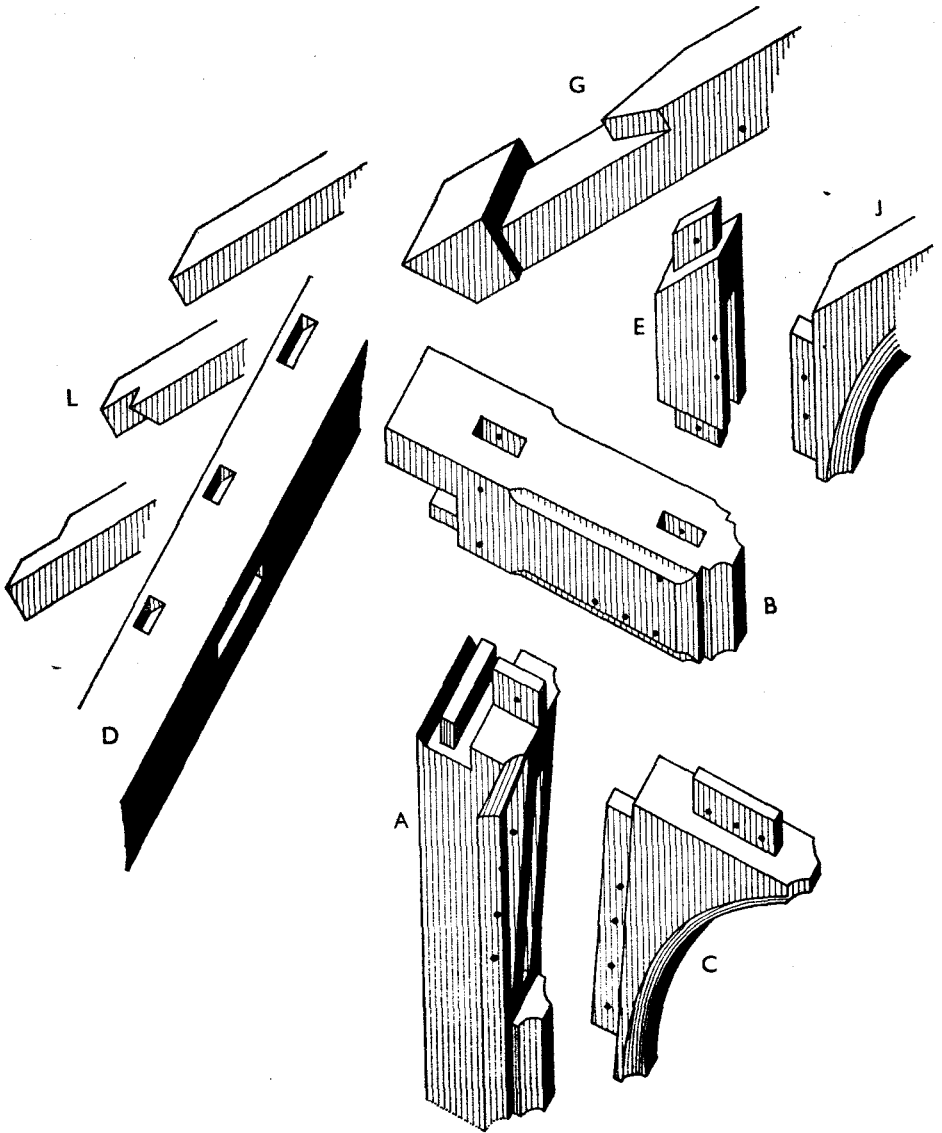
Exploded drawing of hammer-beam joint. A principal post, B hammer-beam, C hammer-beam brace, D top-plate, E hammer-post, F Lower wind-brace, G truss-blade, H lower purlin, I upper wind-brace, J Collar Brace, K collar, L rafter, M upper purlin, N crossed brace.
